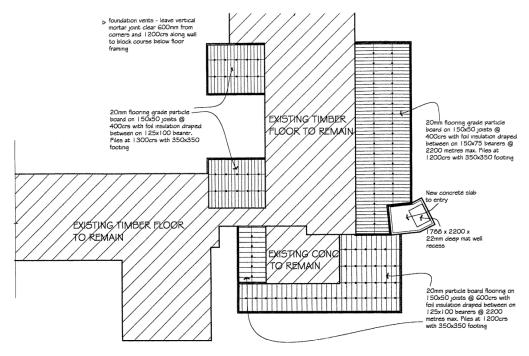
2001 Additions – Ground Floor Framing Plan
